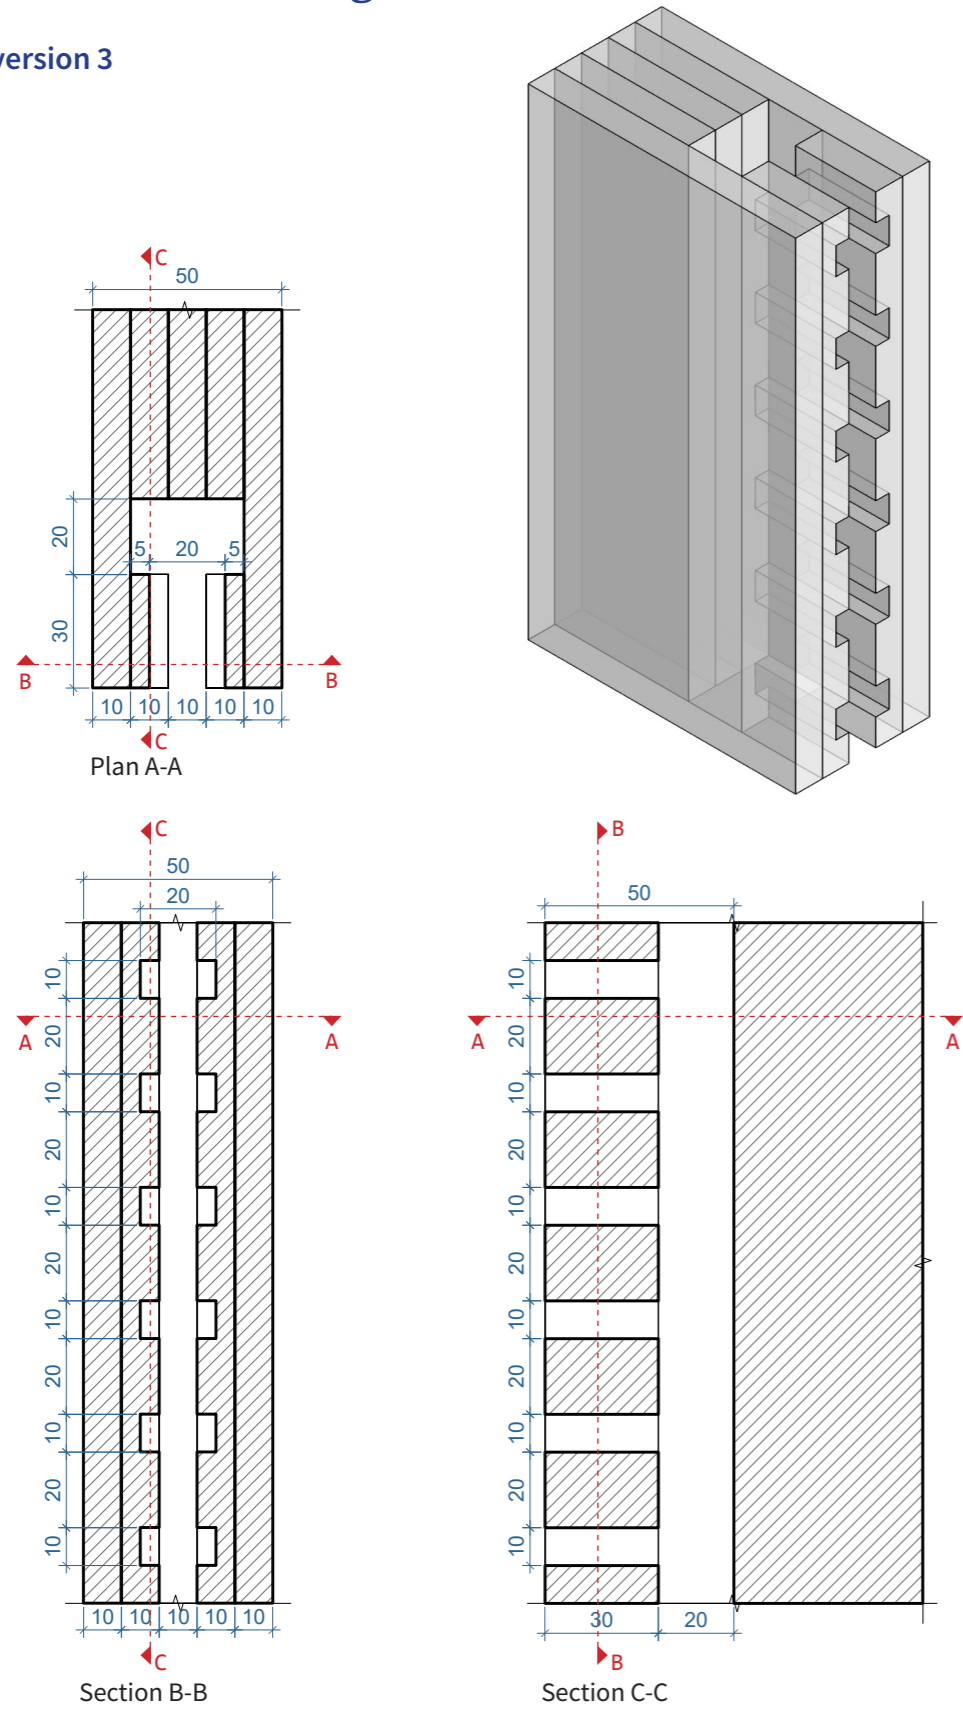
Technical drawings of Glass version 3- Uni.conn | Source: Author
